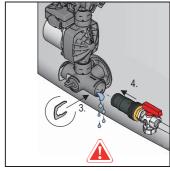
Assembling the in the connecting angle KFE filling connection
